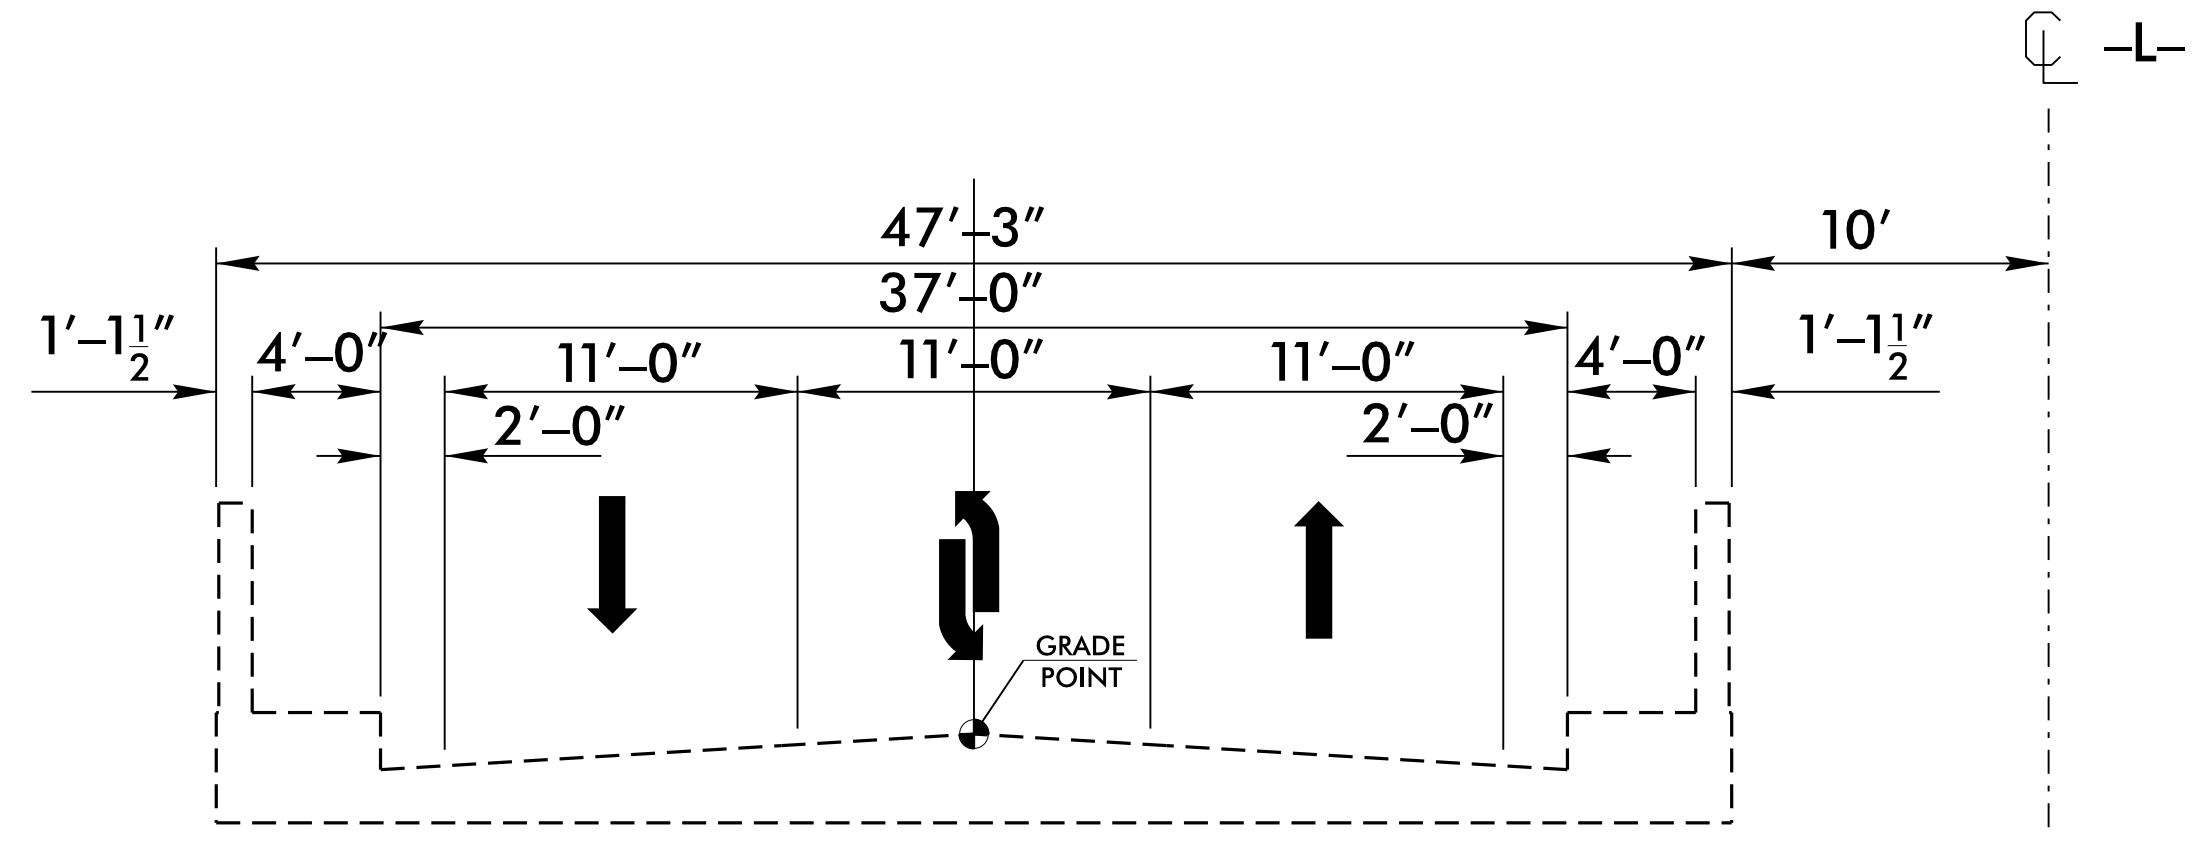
DETAIL OF ROADWAY UNDER PROPOSED STRUCTURE
